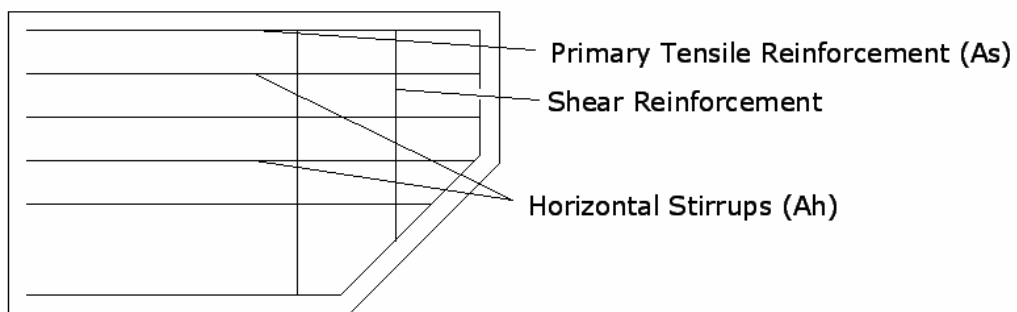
SKETCH OF REINFORCEMENT OF CORBEL PORTION
